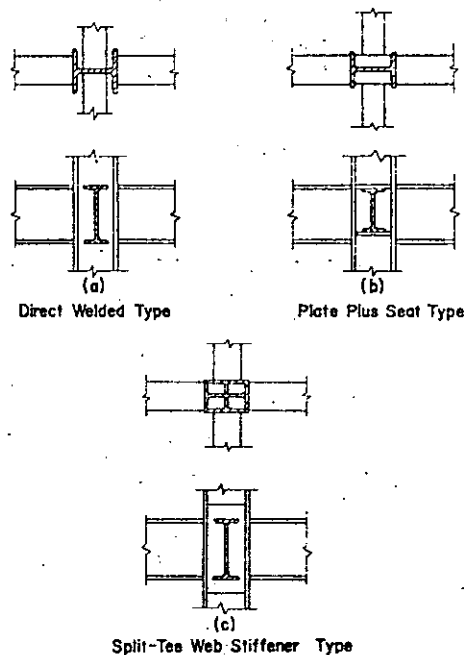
TYPES OF FOUR-WAY INTERIOR BEAM-TO-COLUMN CONNECTIONS
